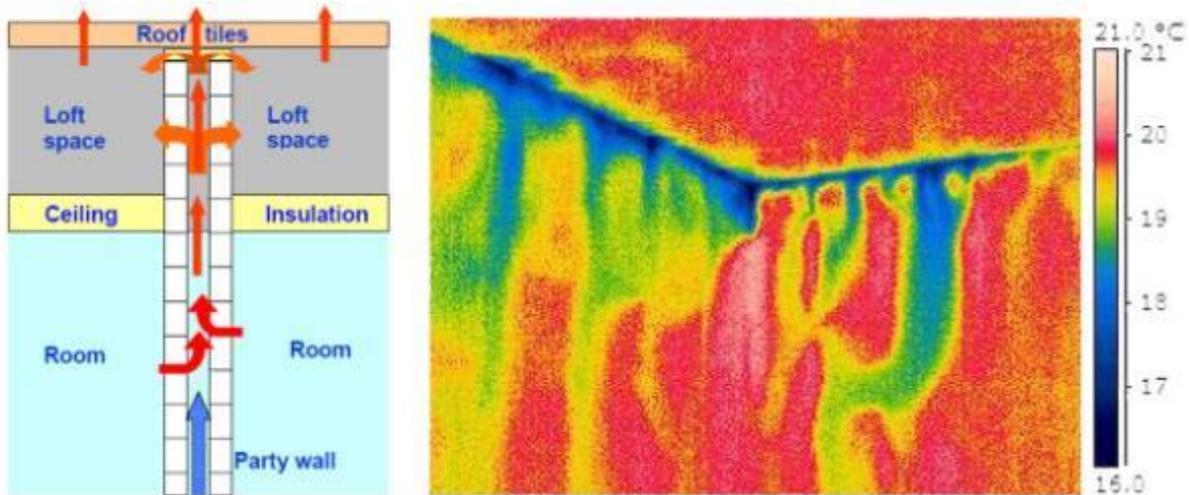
On-site investigations at a housing development in Stamford Brook, London, found that convective heat loss occurred, on one hand, due to heat transfer from rooms either side of a party wall, with a convection current in the wall's cavity causing the air to rise to the colder, uninsulated attic space (left), and, on the other hand, due to air movement behind mechanically fixed plaster-board dry-linings. (Wingfield et al., 2011 / Image © DCLG)
